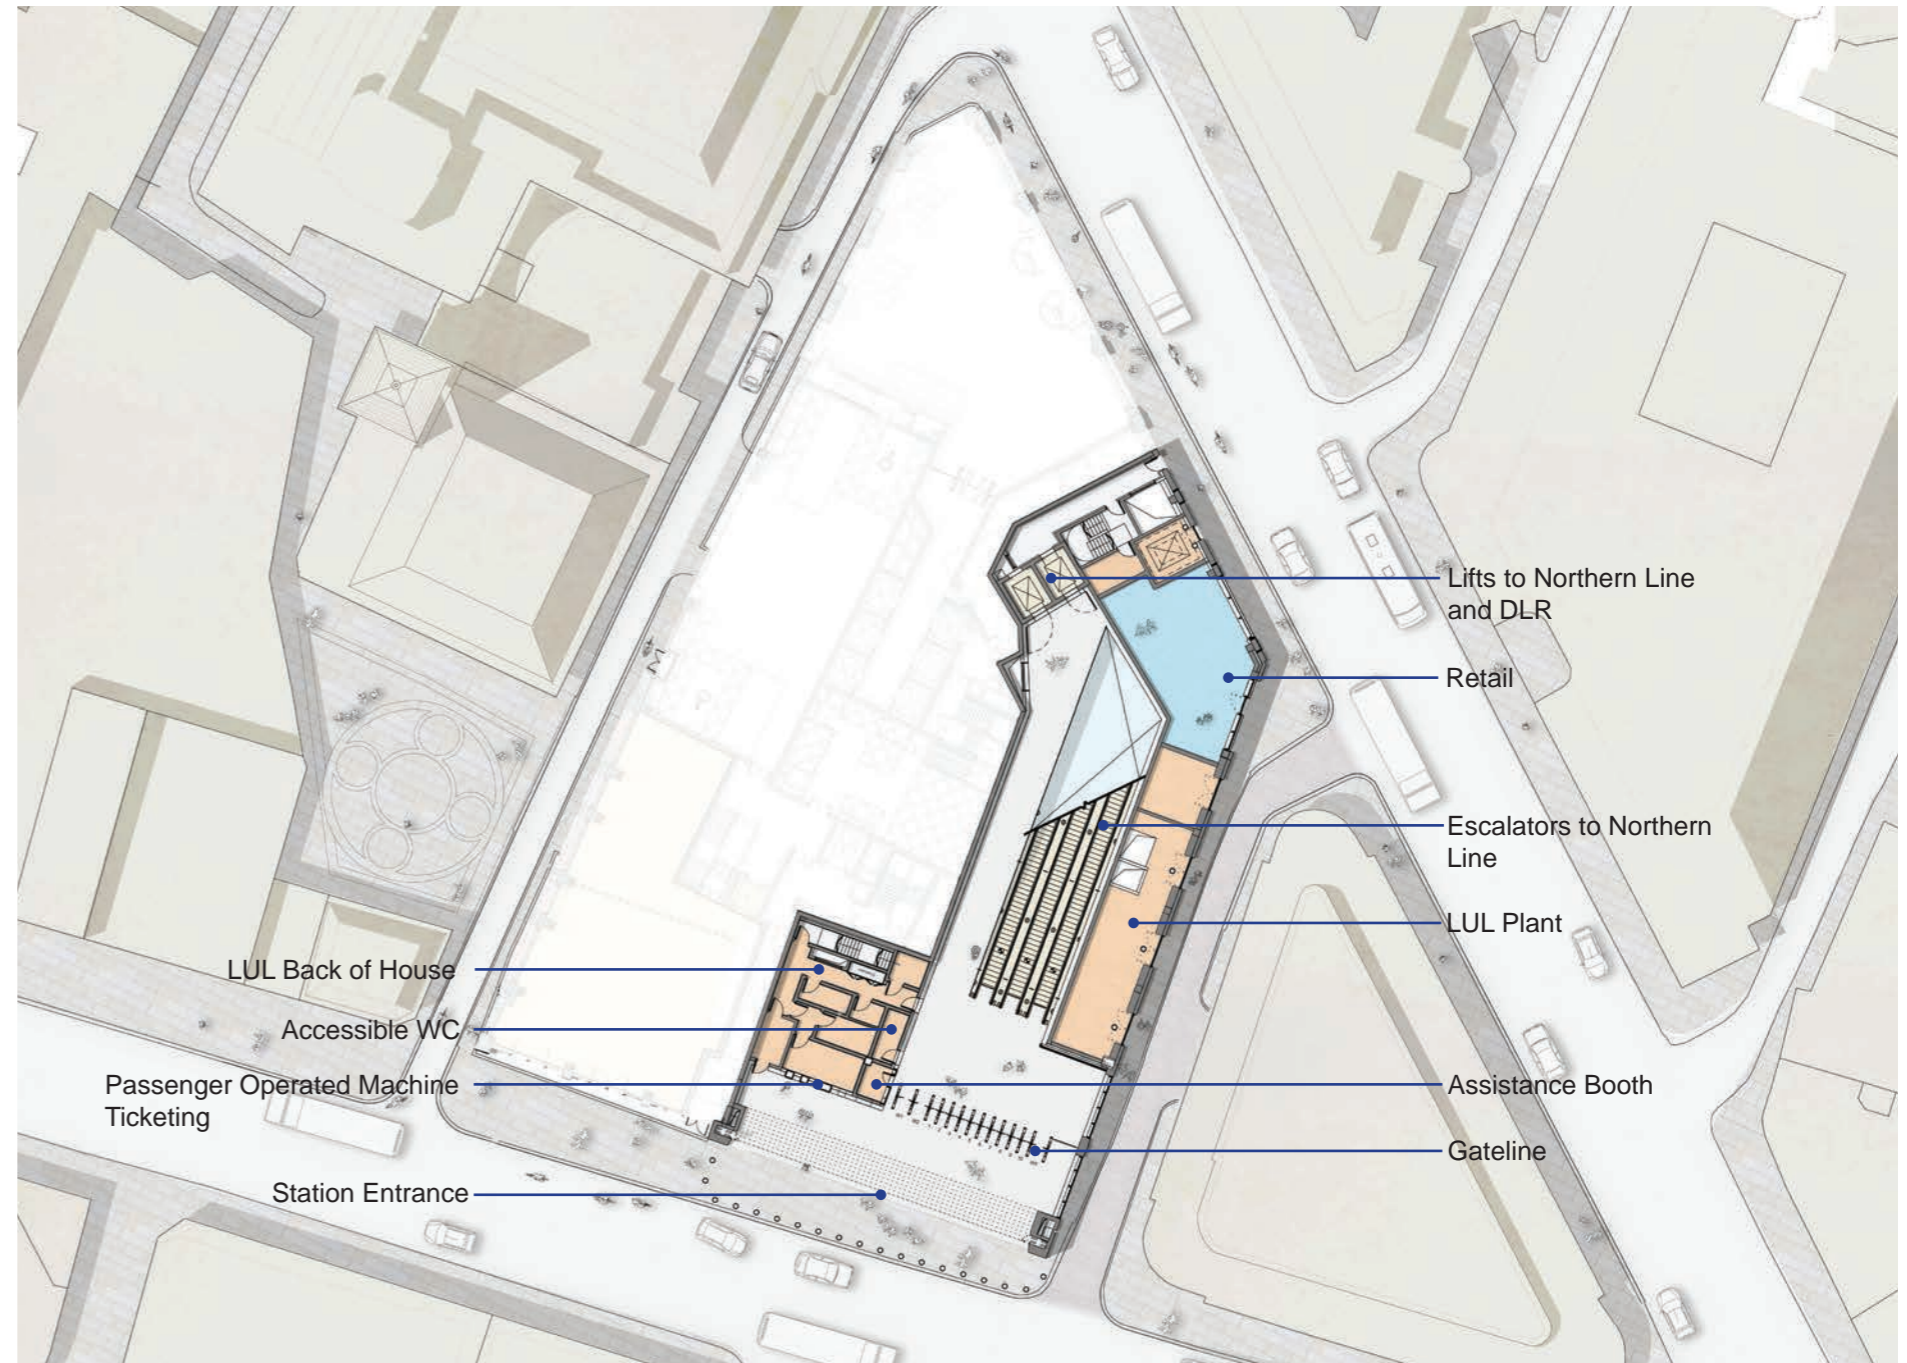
Proposed ground floor plan of the Station Entrance Hall on Cannon Street
